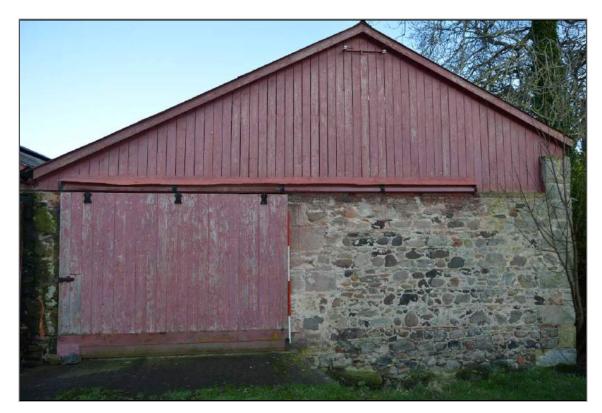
South elevation of south animal shed east gable (facing north). Scale 2m.
